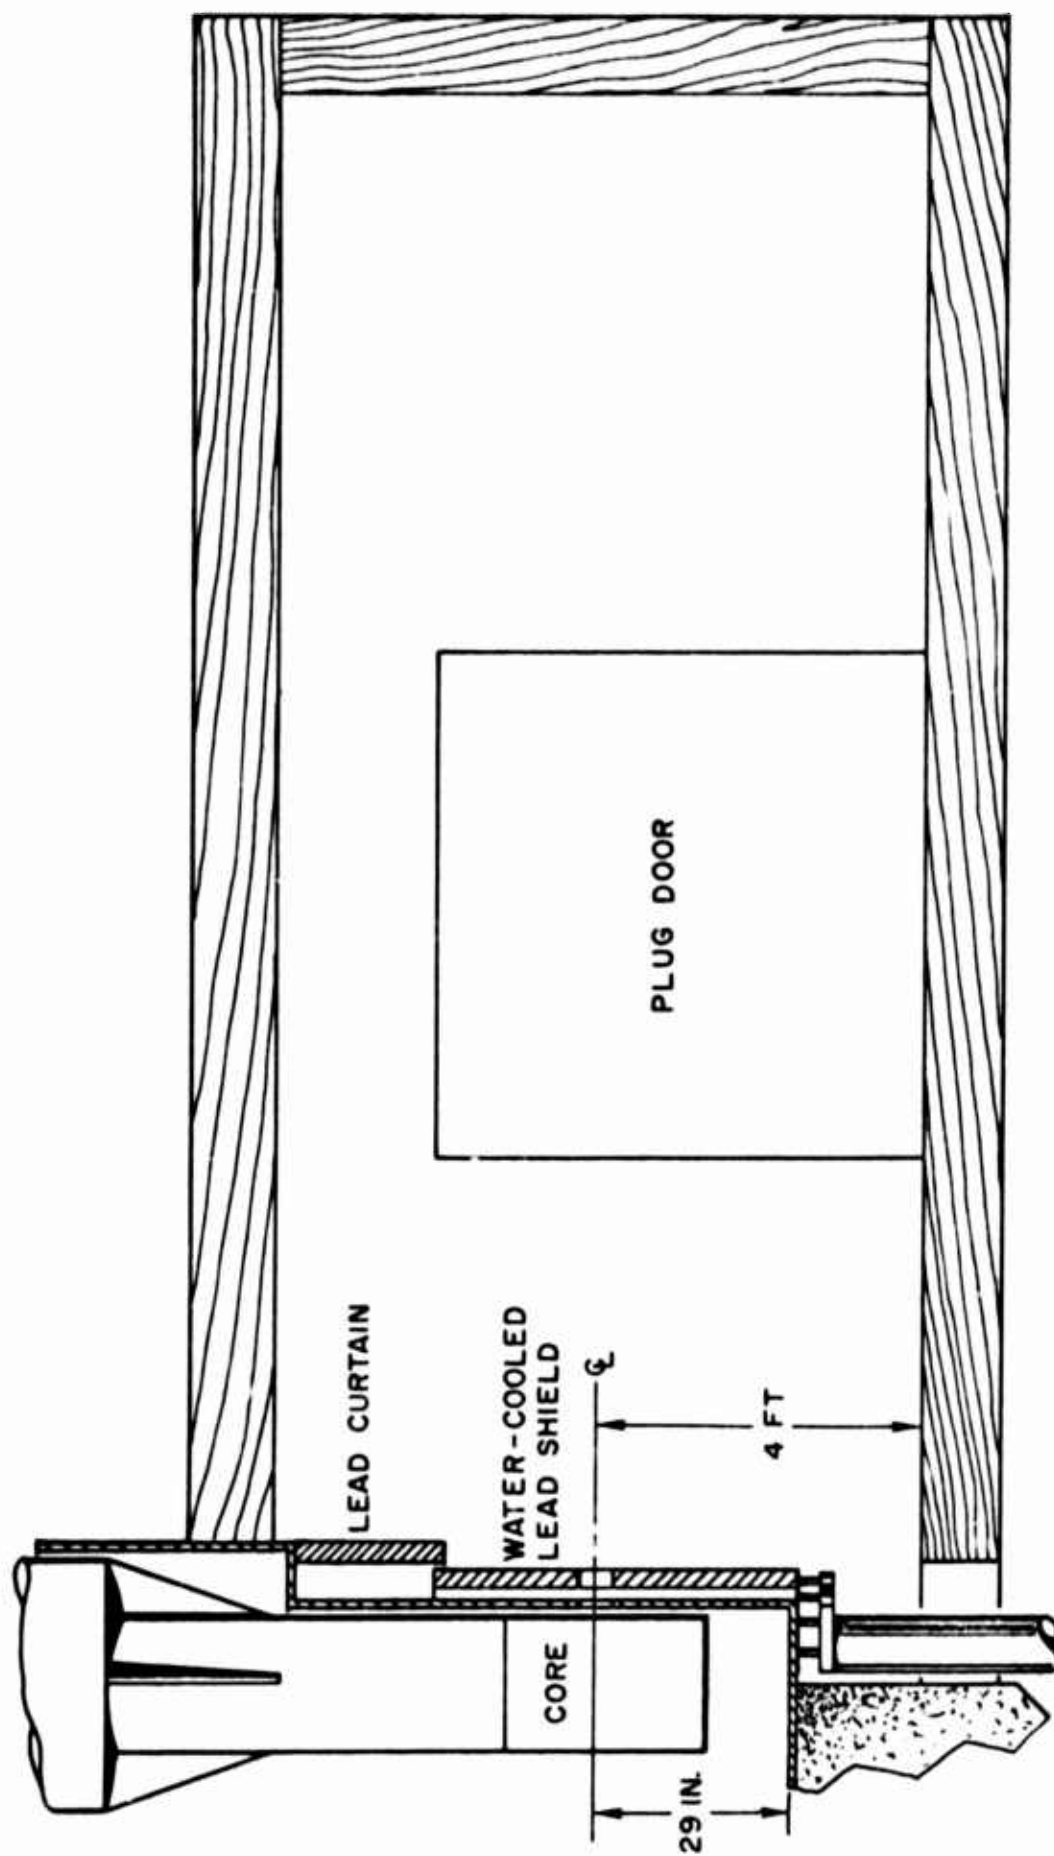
ELEVATION VIEW OF EXPOSURE ROOM
